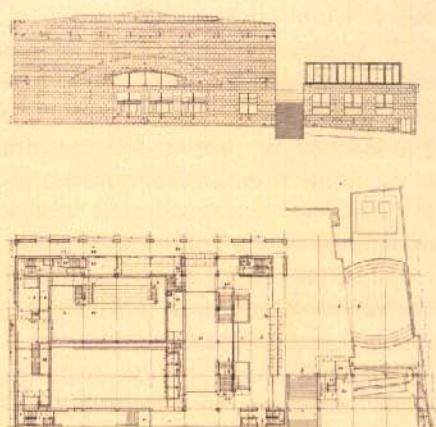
Ground floor plan and Nordwest Elevation and the Salamanca Cathedral
